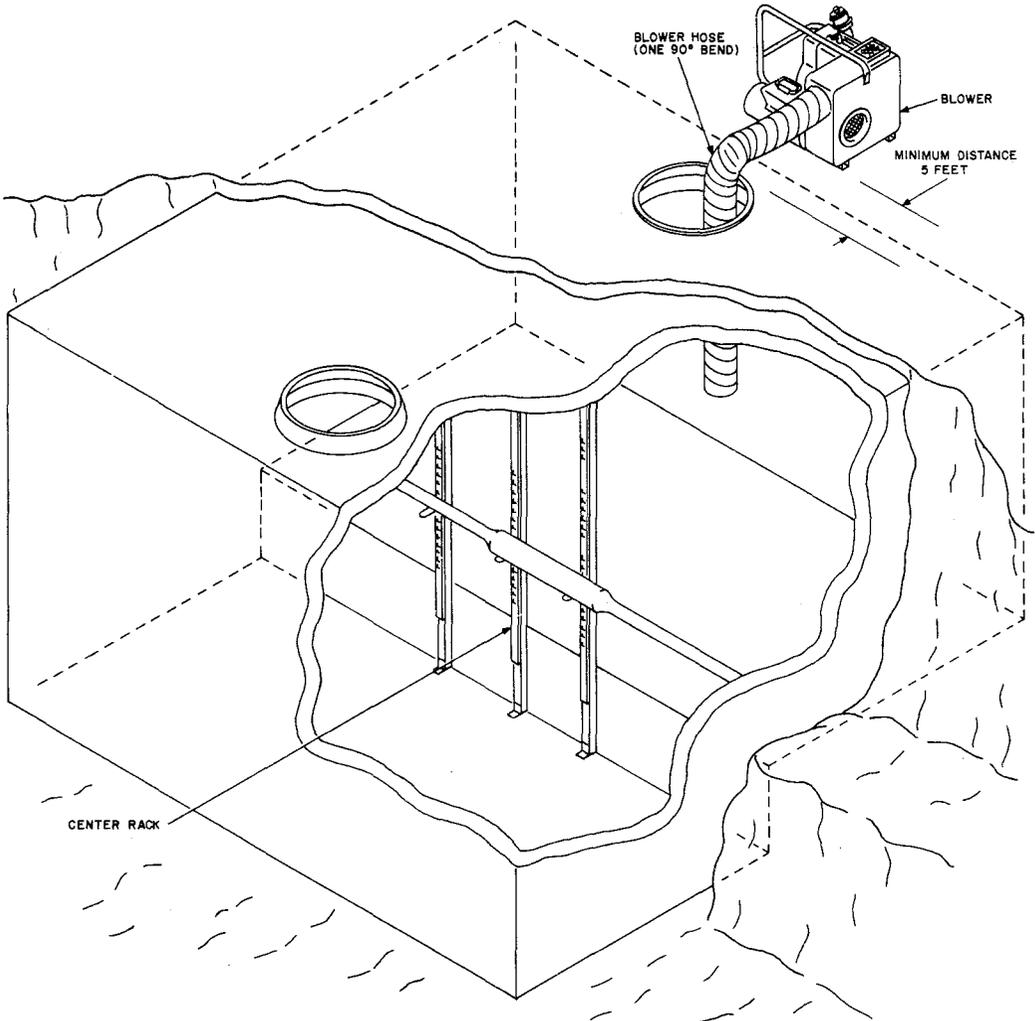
Typical Setup for Purging Irregular Shape Manholes
